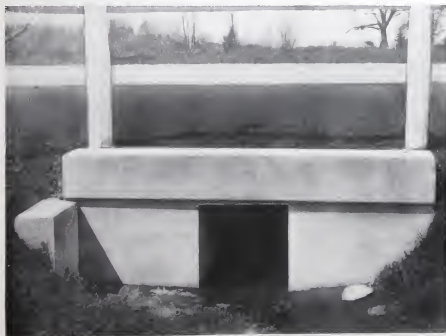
Concrete Culvert, Amherst, Massachusetts. Designed by Massachusetts Highway Commission. 2-foot by 2-foot Opening. 24-foot Roadway. Cost \$102.
